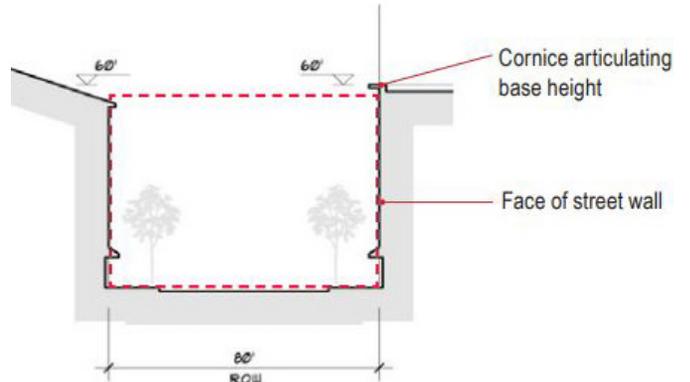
Street section with 3:4 proportions, with cornice articulation defining building base height.
